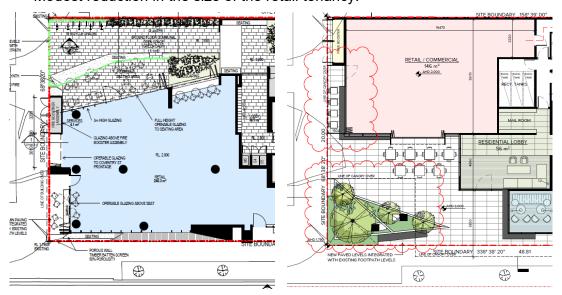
Endorsed (left) and proposed (right) Ground Level Plan extract. From Drawings TP02.03 & TP-206
